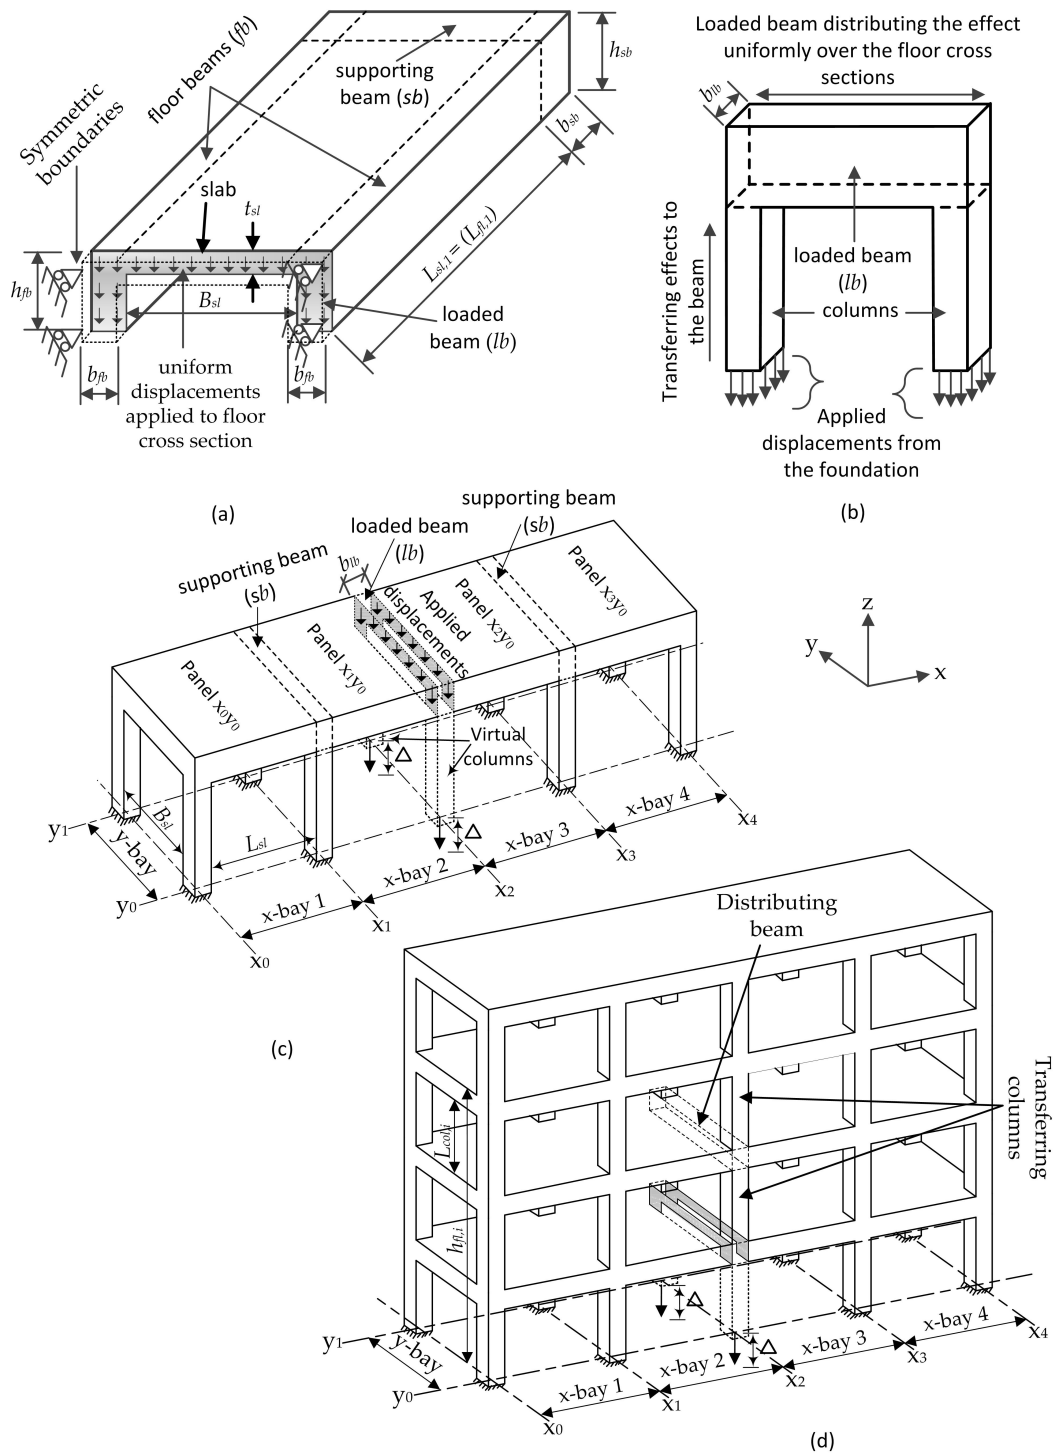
(a) Typical floor subjected to displacements, (b) conveying displacement effects through columns to beams, (c) typical numerical model of a single storey, single y-bay building, (d) single y-bay, multi x-bay and multi storey building
